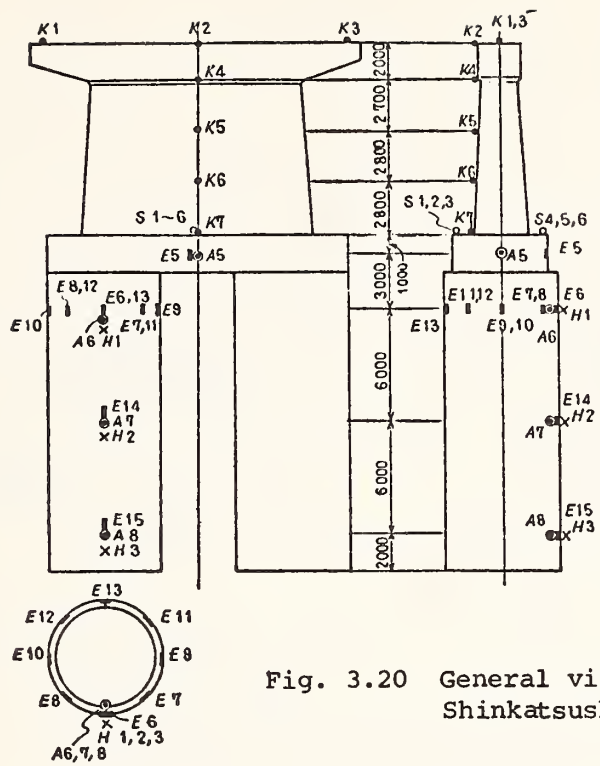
General view of pier 4 of the Shinkatsushika bridge
